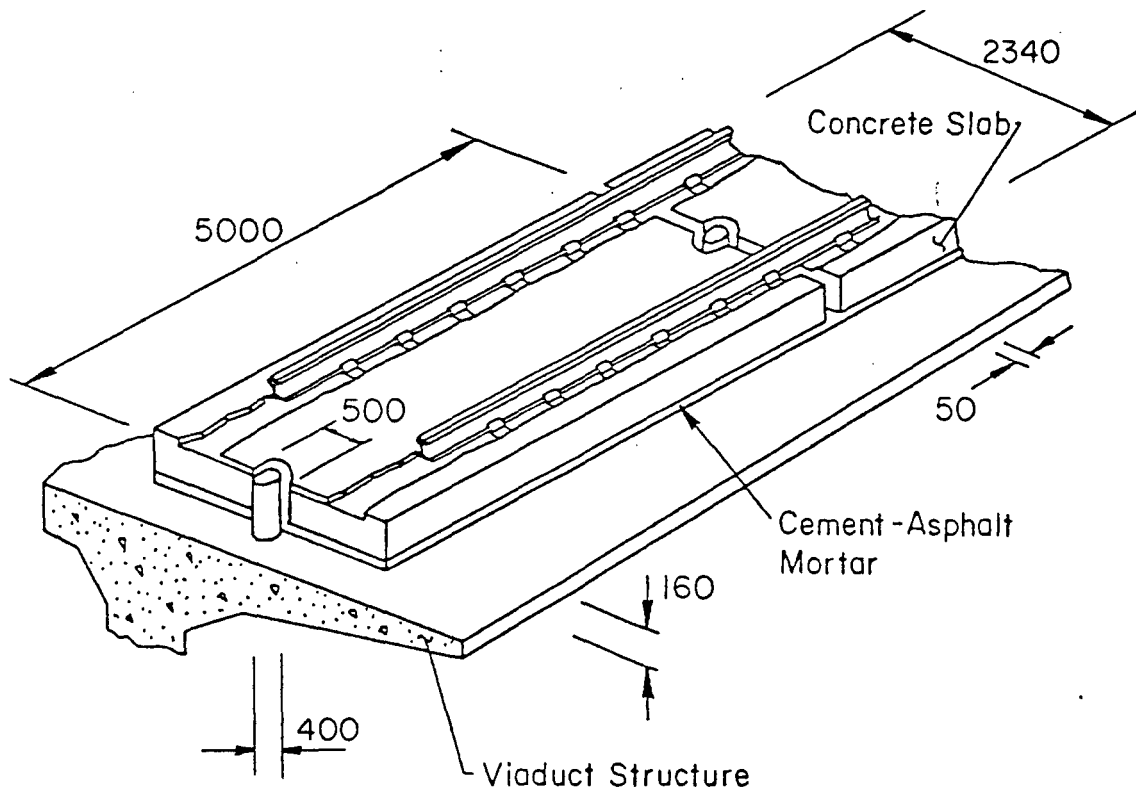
Track on Concrete Slab on Elevated Structure Tested by the Japanese National Railways - The Tokaido Line
